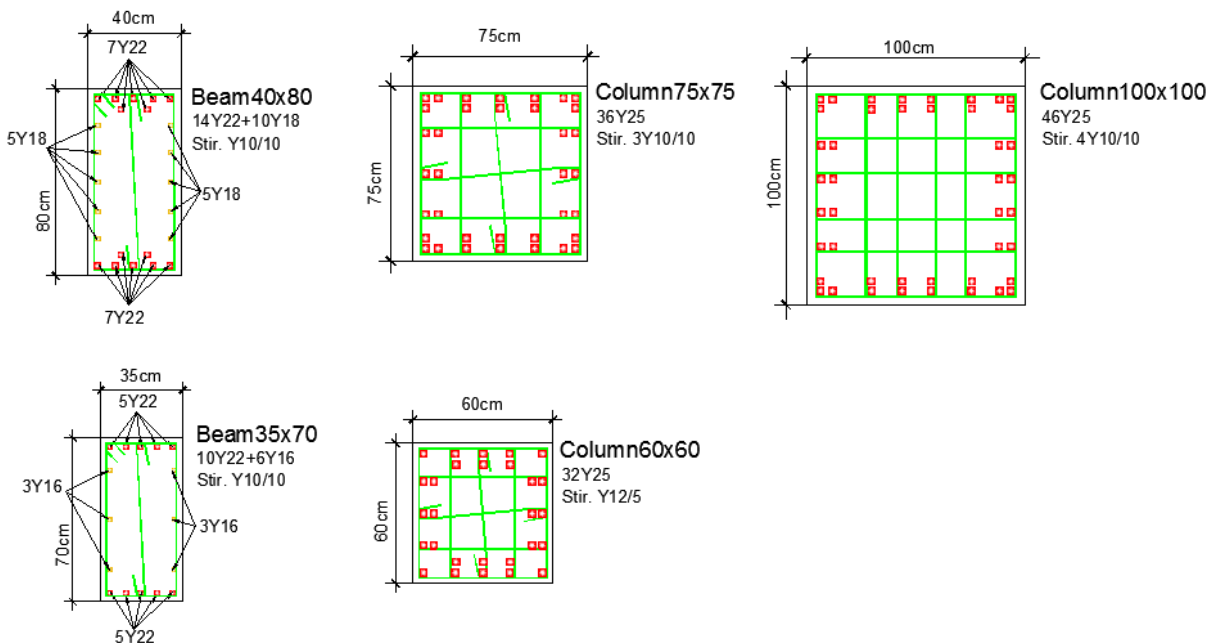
RC HIGH RISE BUILDING. RC SECTIONS REINFORCEMENT DETAILS.
